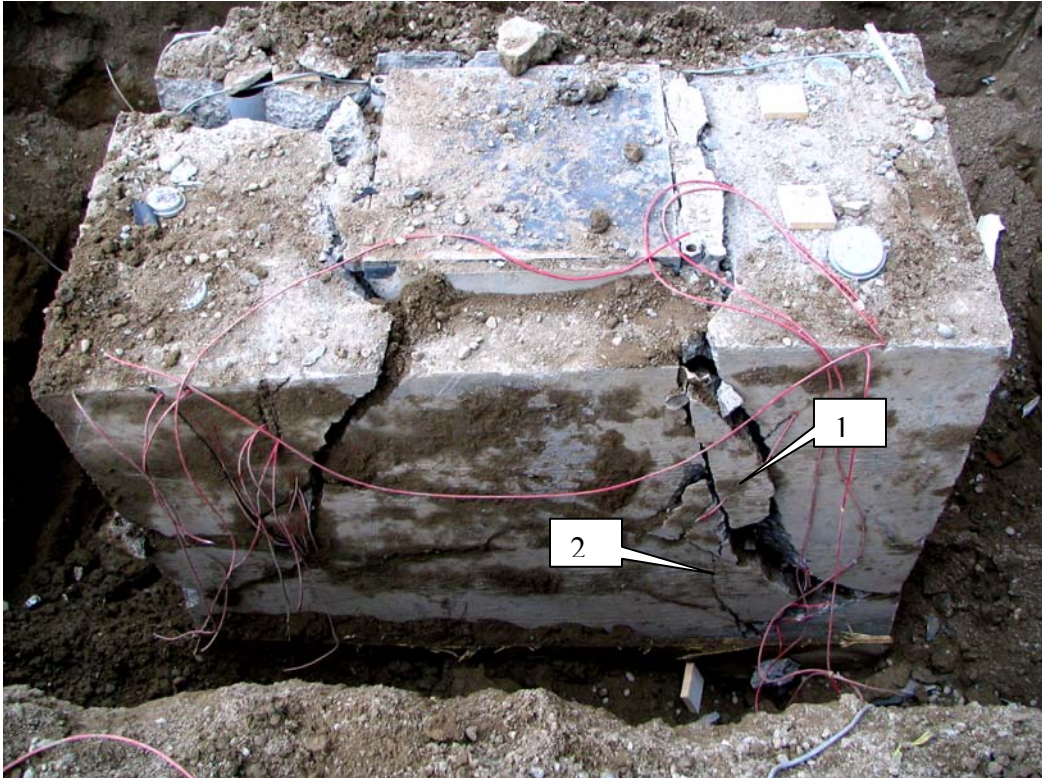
Longitudinal Face of Pile Cap after Failure
